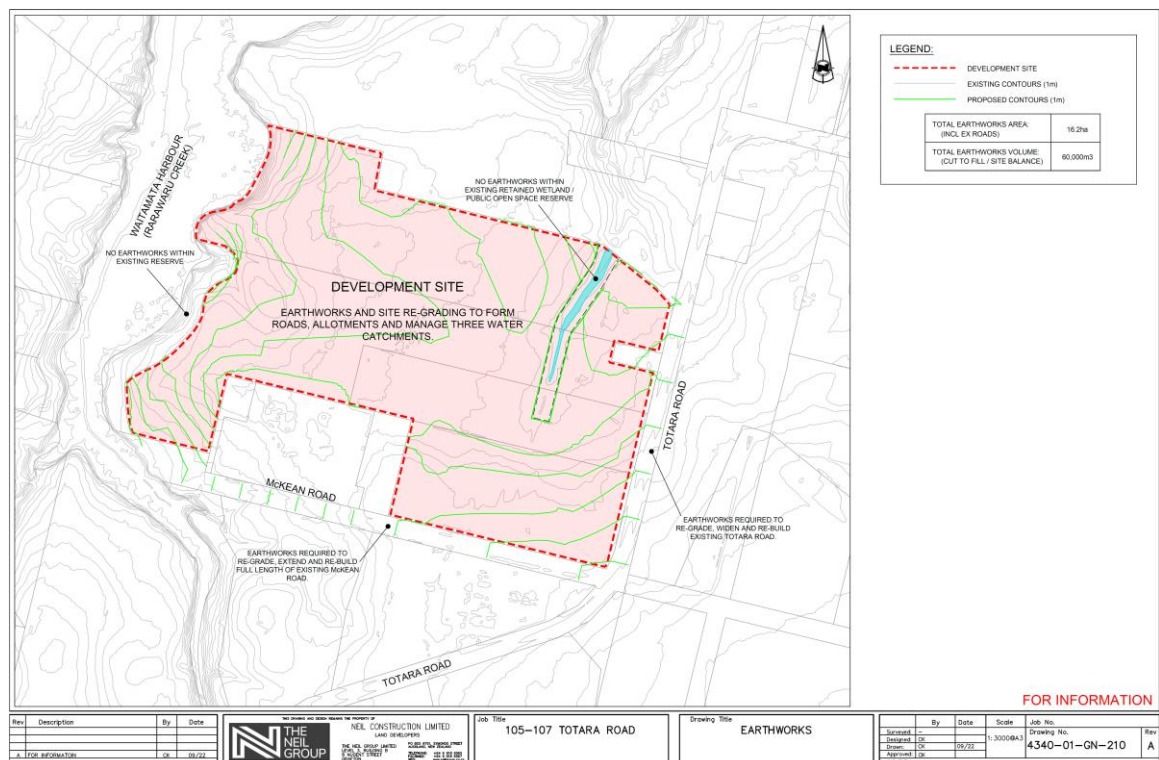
Preliminary earthworks plan for the proposed residential subdivision with area (source: The Neil Group)
